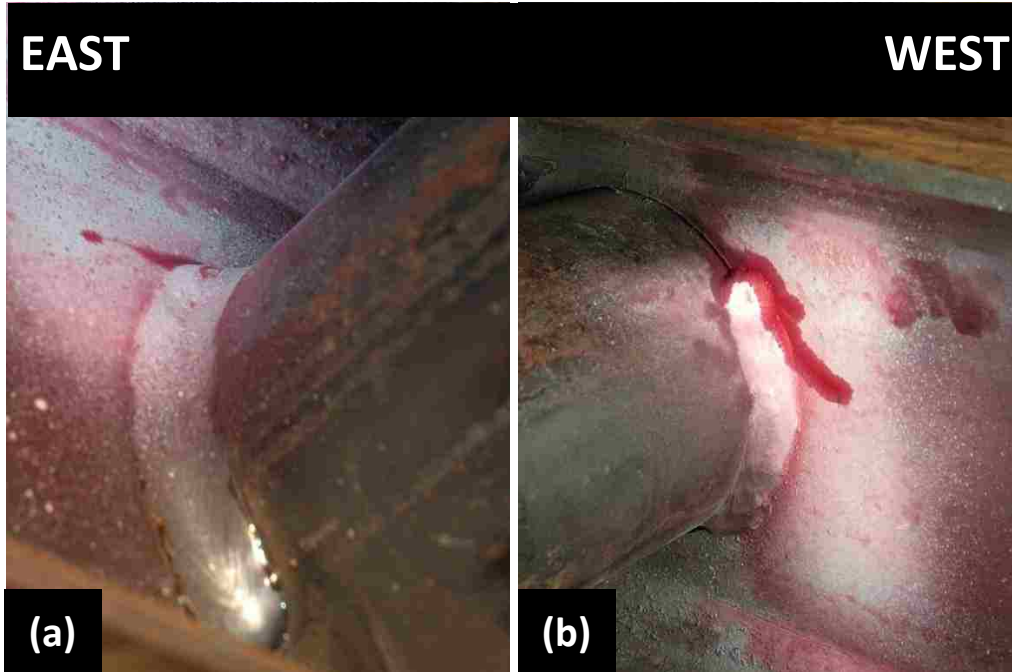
Specimen #1, cracks at S9-T2 connection (a) east weld crack, (b) west weld crack
